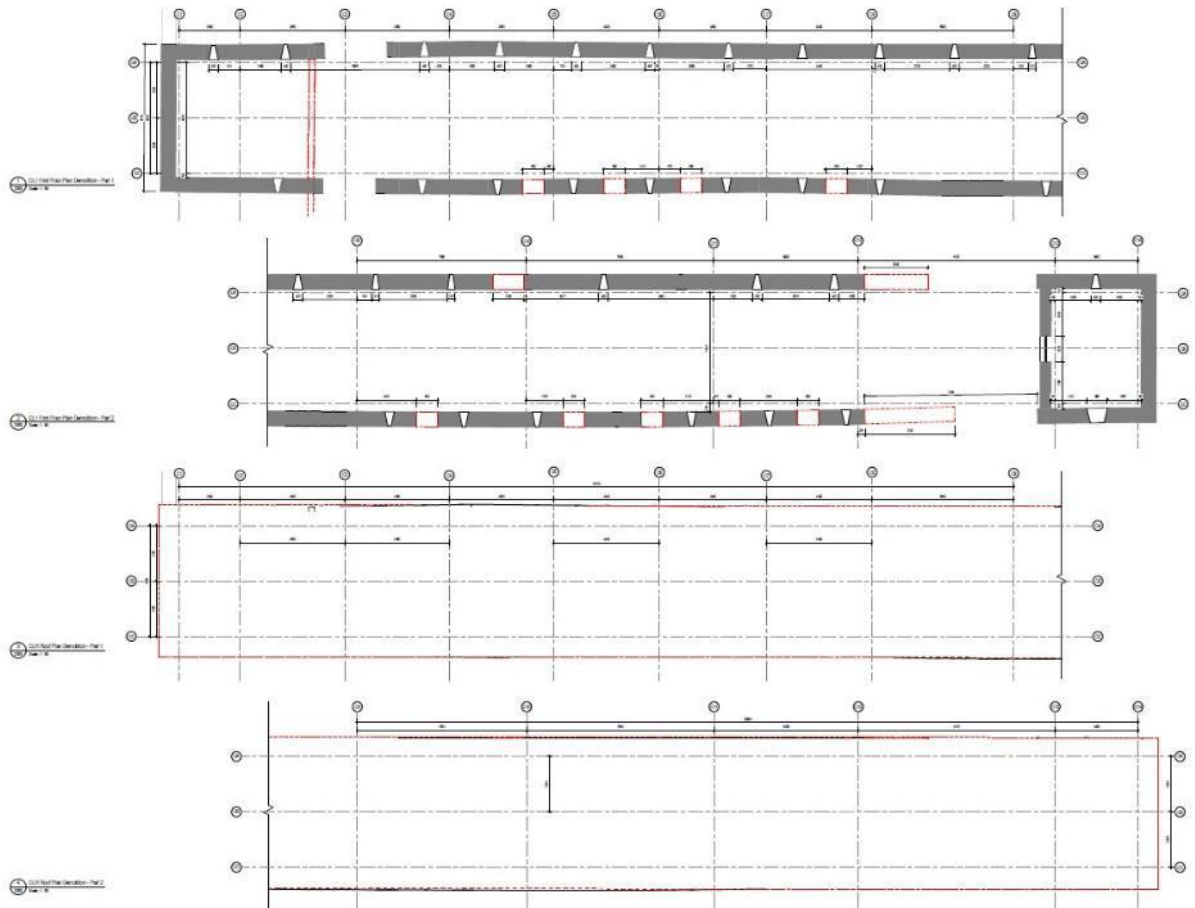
Demolition first floor and roof plan. From top to bottom: first floor parts 1 & 2, roof plans parts 1&2. Source: TOT Architects. Dashed red lines indication partitions removal.
